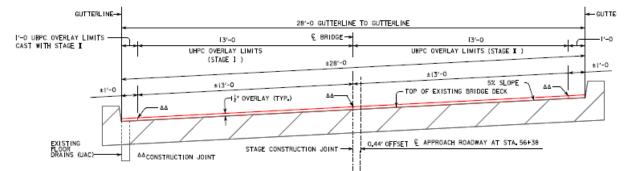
Schematic of a UHPC bridge deck overlay (courtesy of Buchanan County Iowa)
